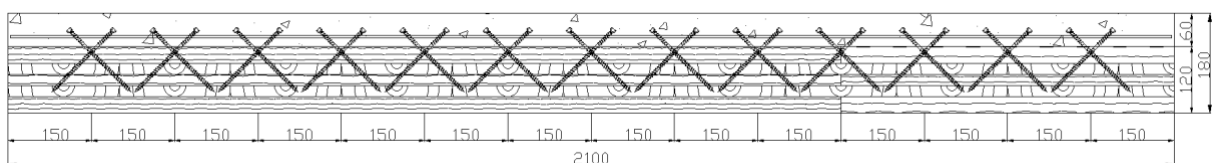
Longitudinal section of the CLT-concrete composite slab with CTC screws [mm]
